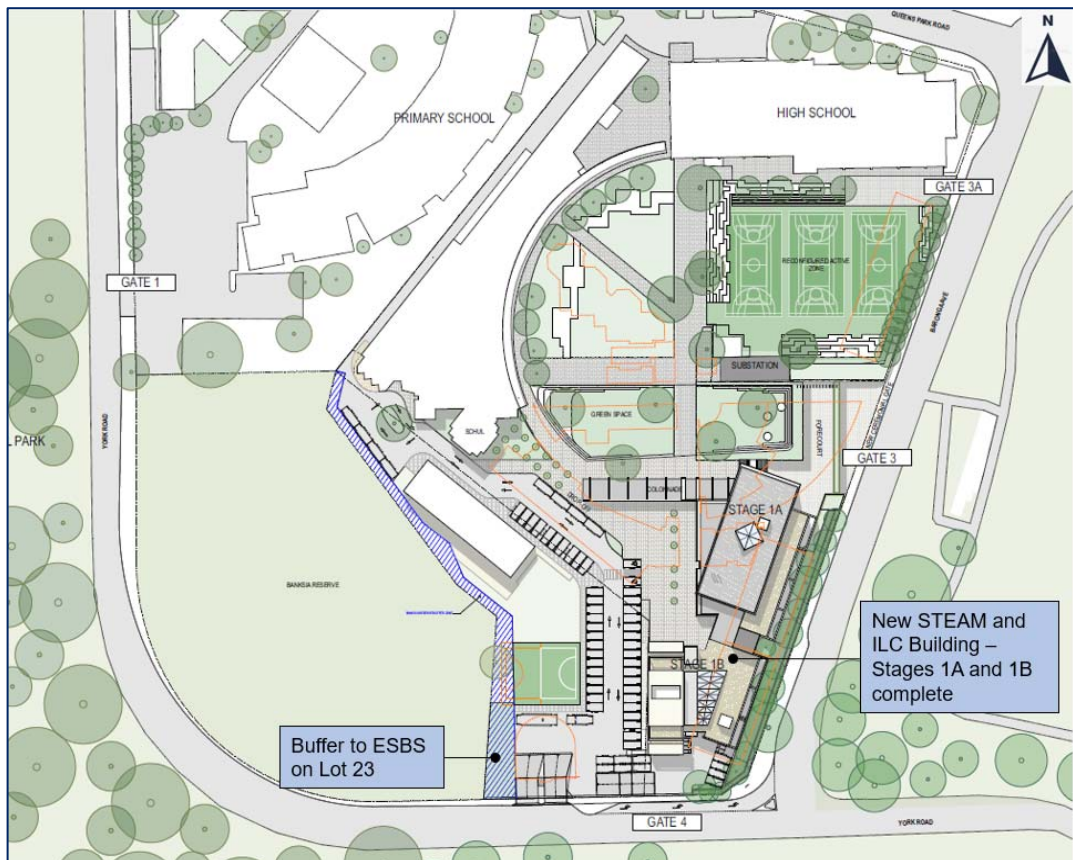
| Site layout – Stage 1B completion (Base source: Applicant's SRtS)
